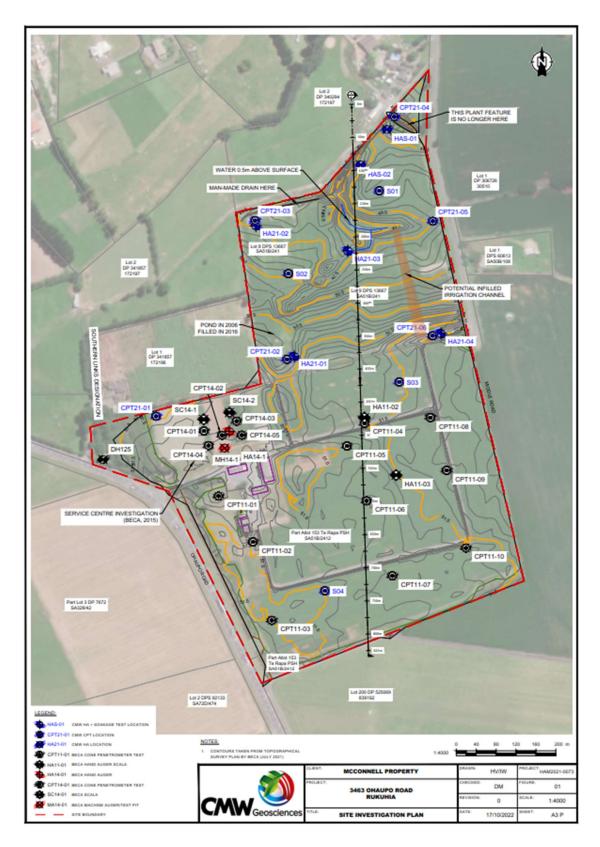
Site Plan with Geotechnical Test Locations (RPL Block)
